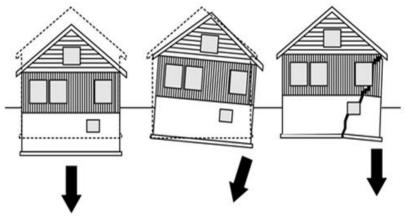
FOUNDATION SETTLEMENTS (PREETHAMBUILDERS, 2017)
